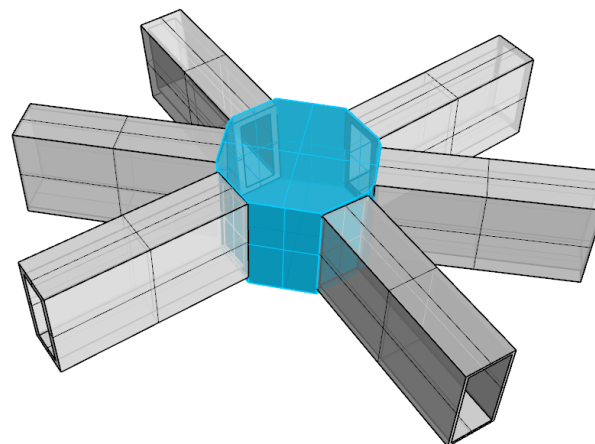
Type 2: Welded joint, because of the applied welds the design domain can remain as a solid block. (Blue: design domain)
